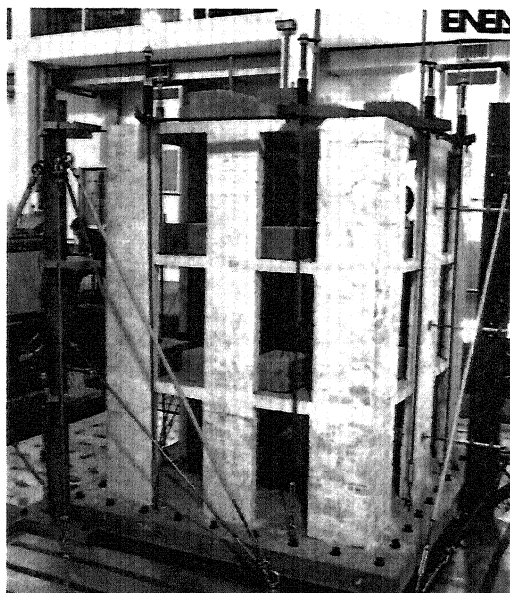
General view of the model as it was instrumented and installed on the shaking table.
